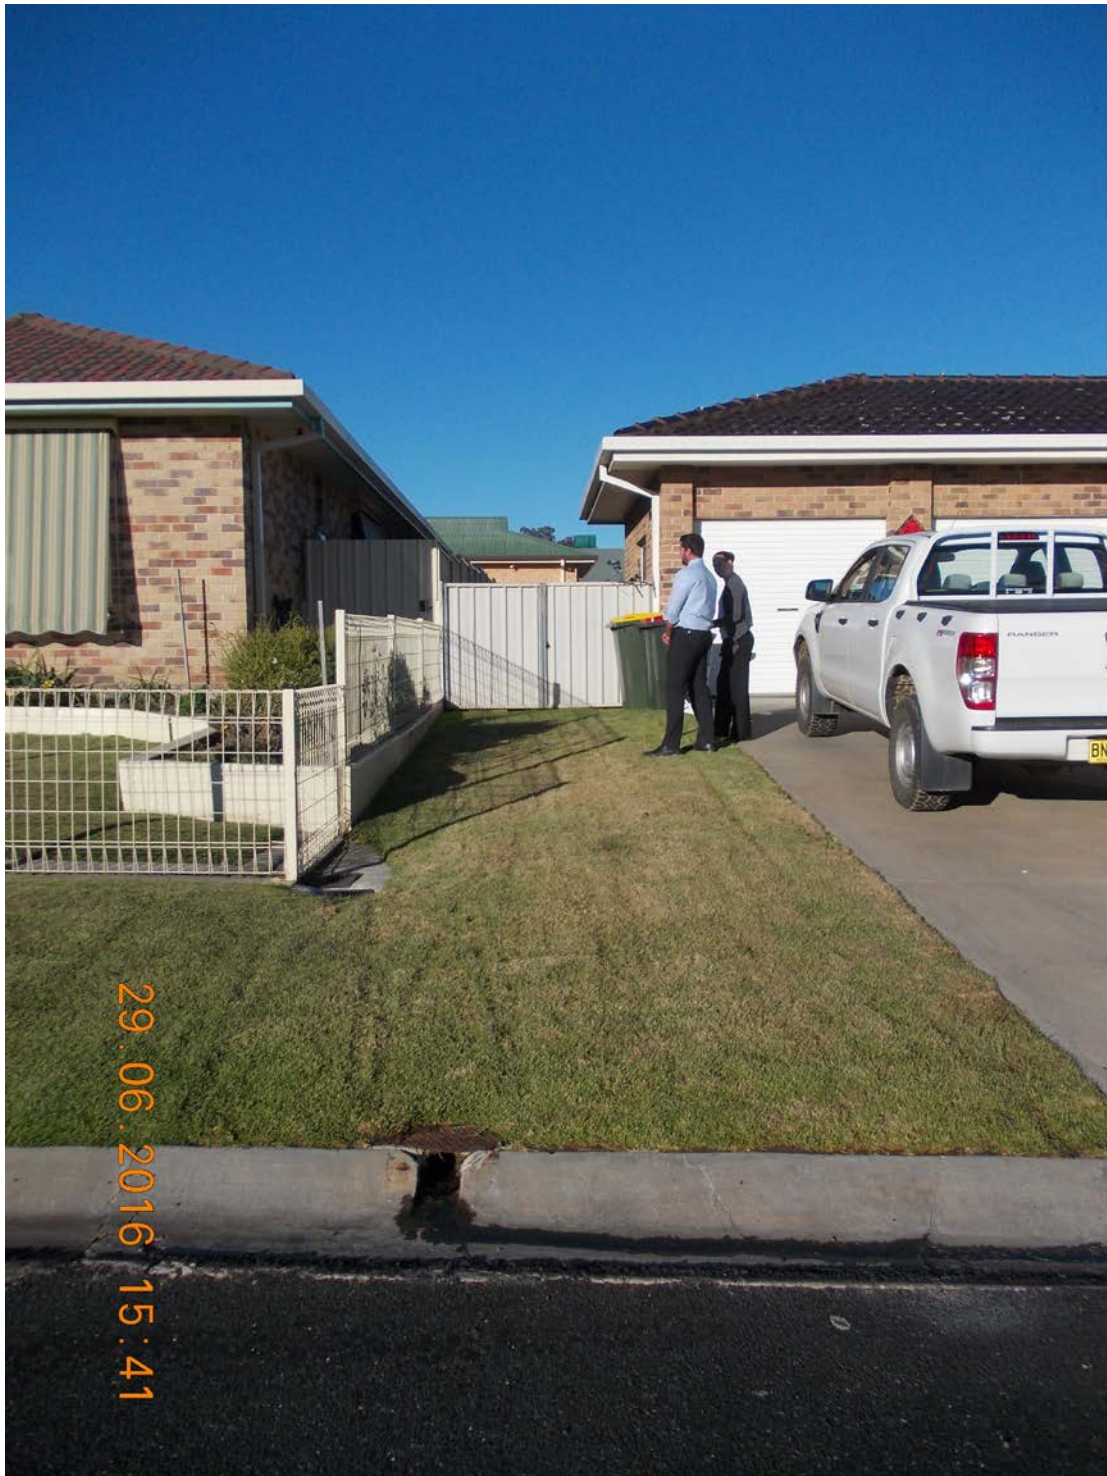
Photo of access to rear yard, street drainage and two (2) additional drainage pits adjacent to front fence corner of the adjoining property.
